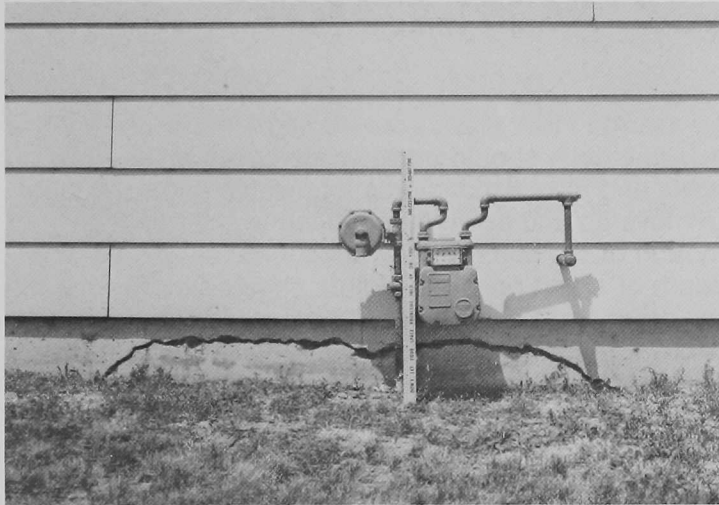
The crack in this foundation was caused by highly swelling soil.
